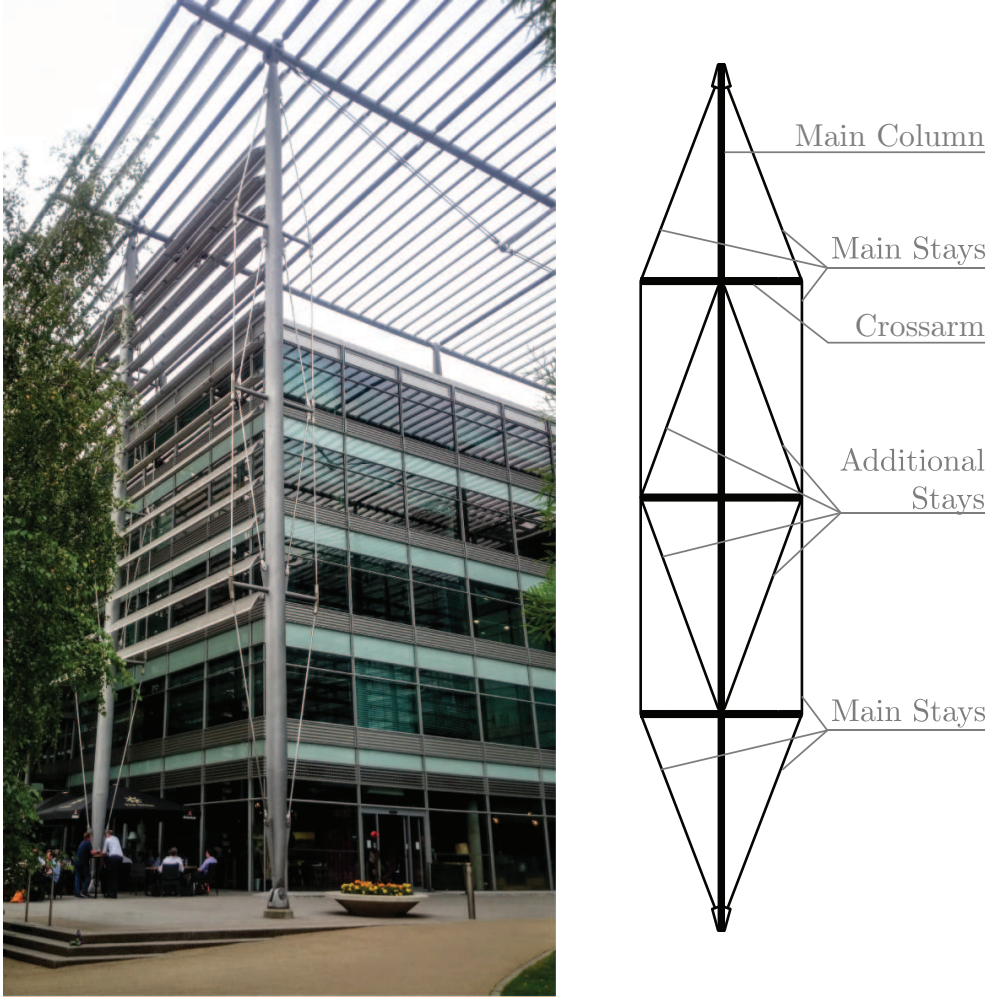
Triple-crossarm stayed column with additional stays at Building 5, Chiswick Park, London, UK.
